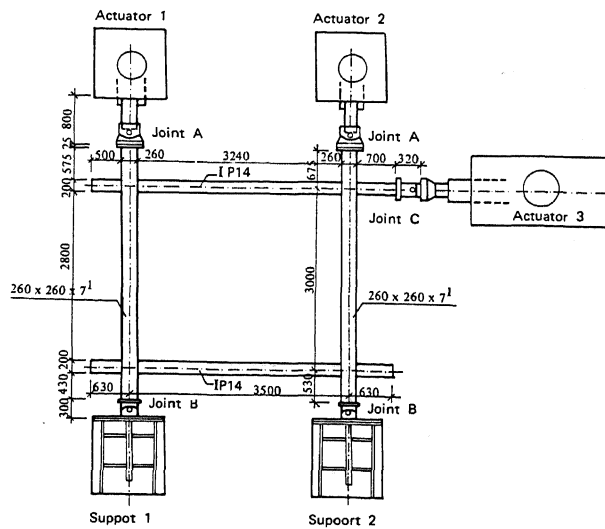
Frame model without energy absorbing elements tested under combined axial load and cyclic lateral loading
